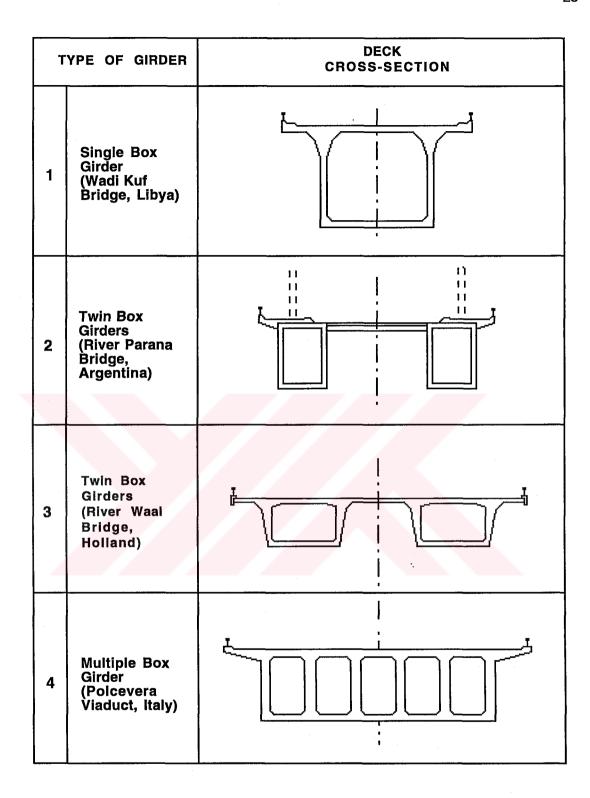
REINFORCED AND PRESTRESSED CONCRETE GIRDER
